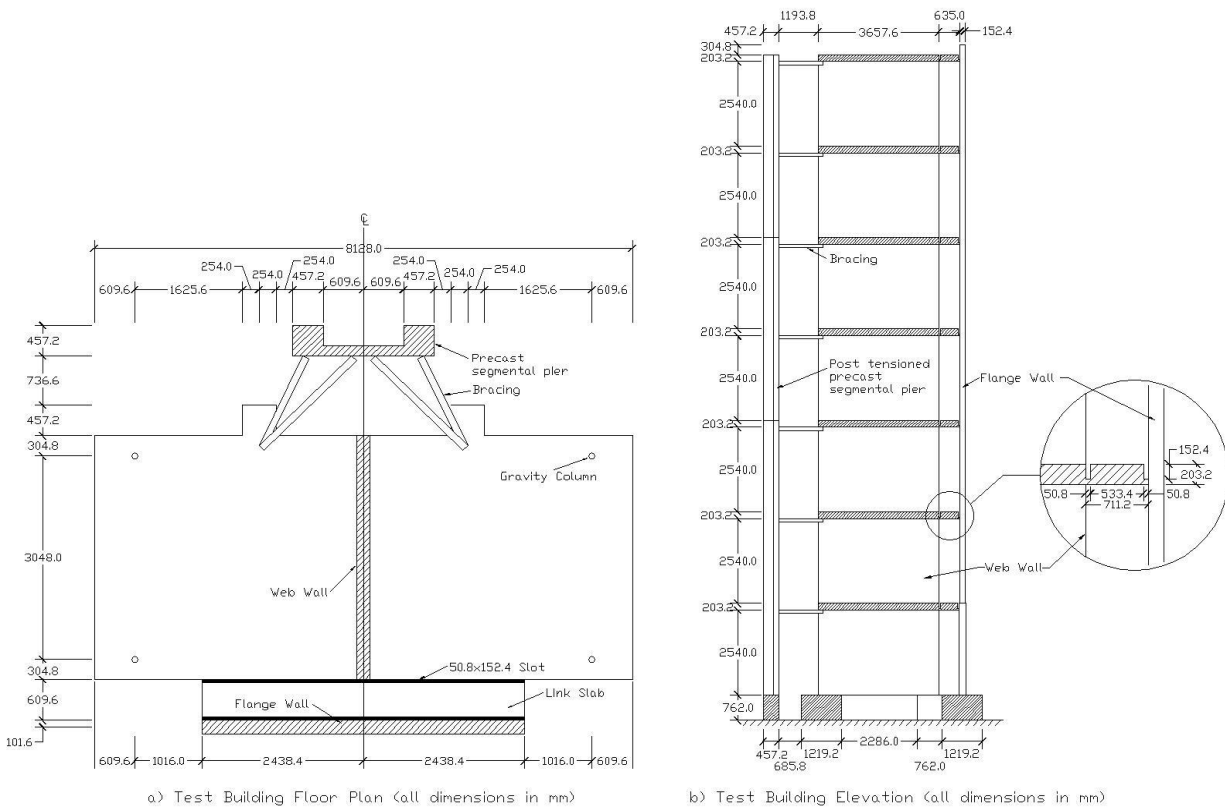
Plan and Elevation of the Test Building [after NEES7Story, 2006].
